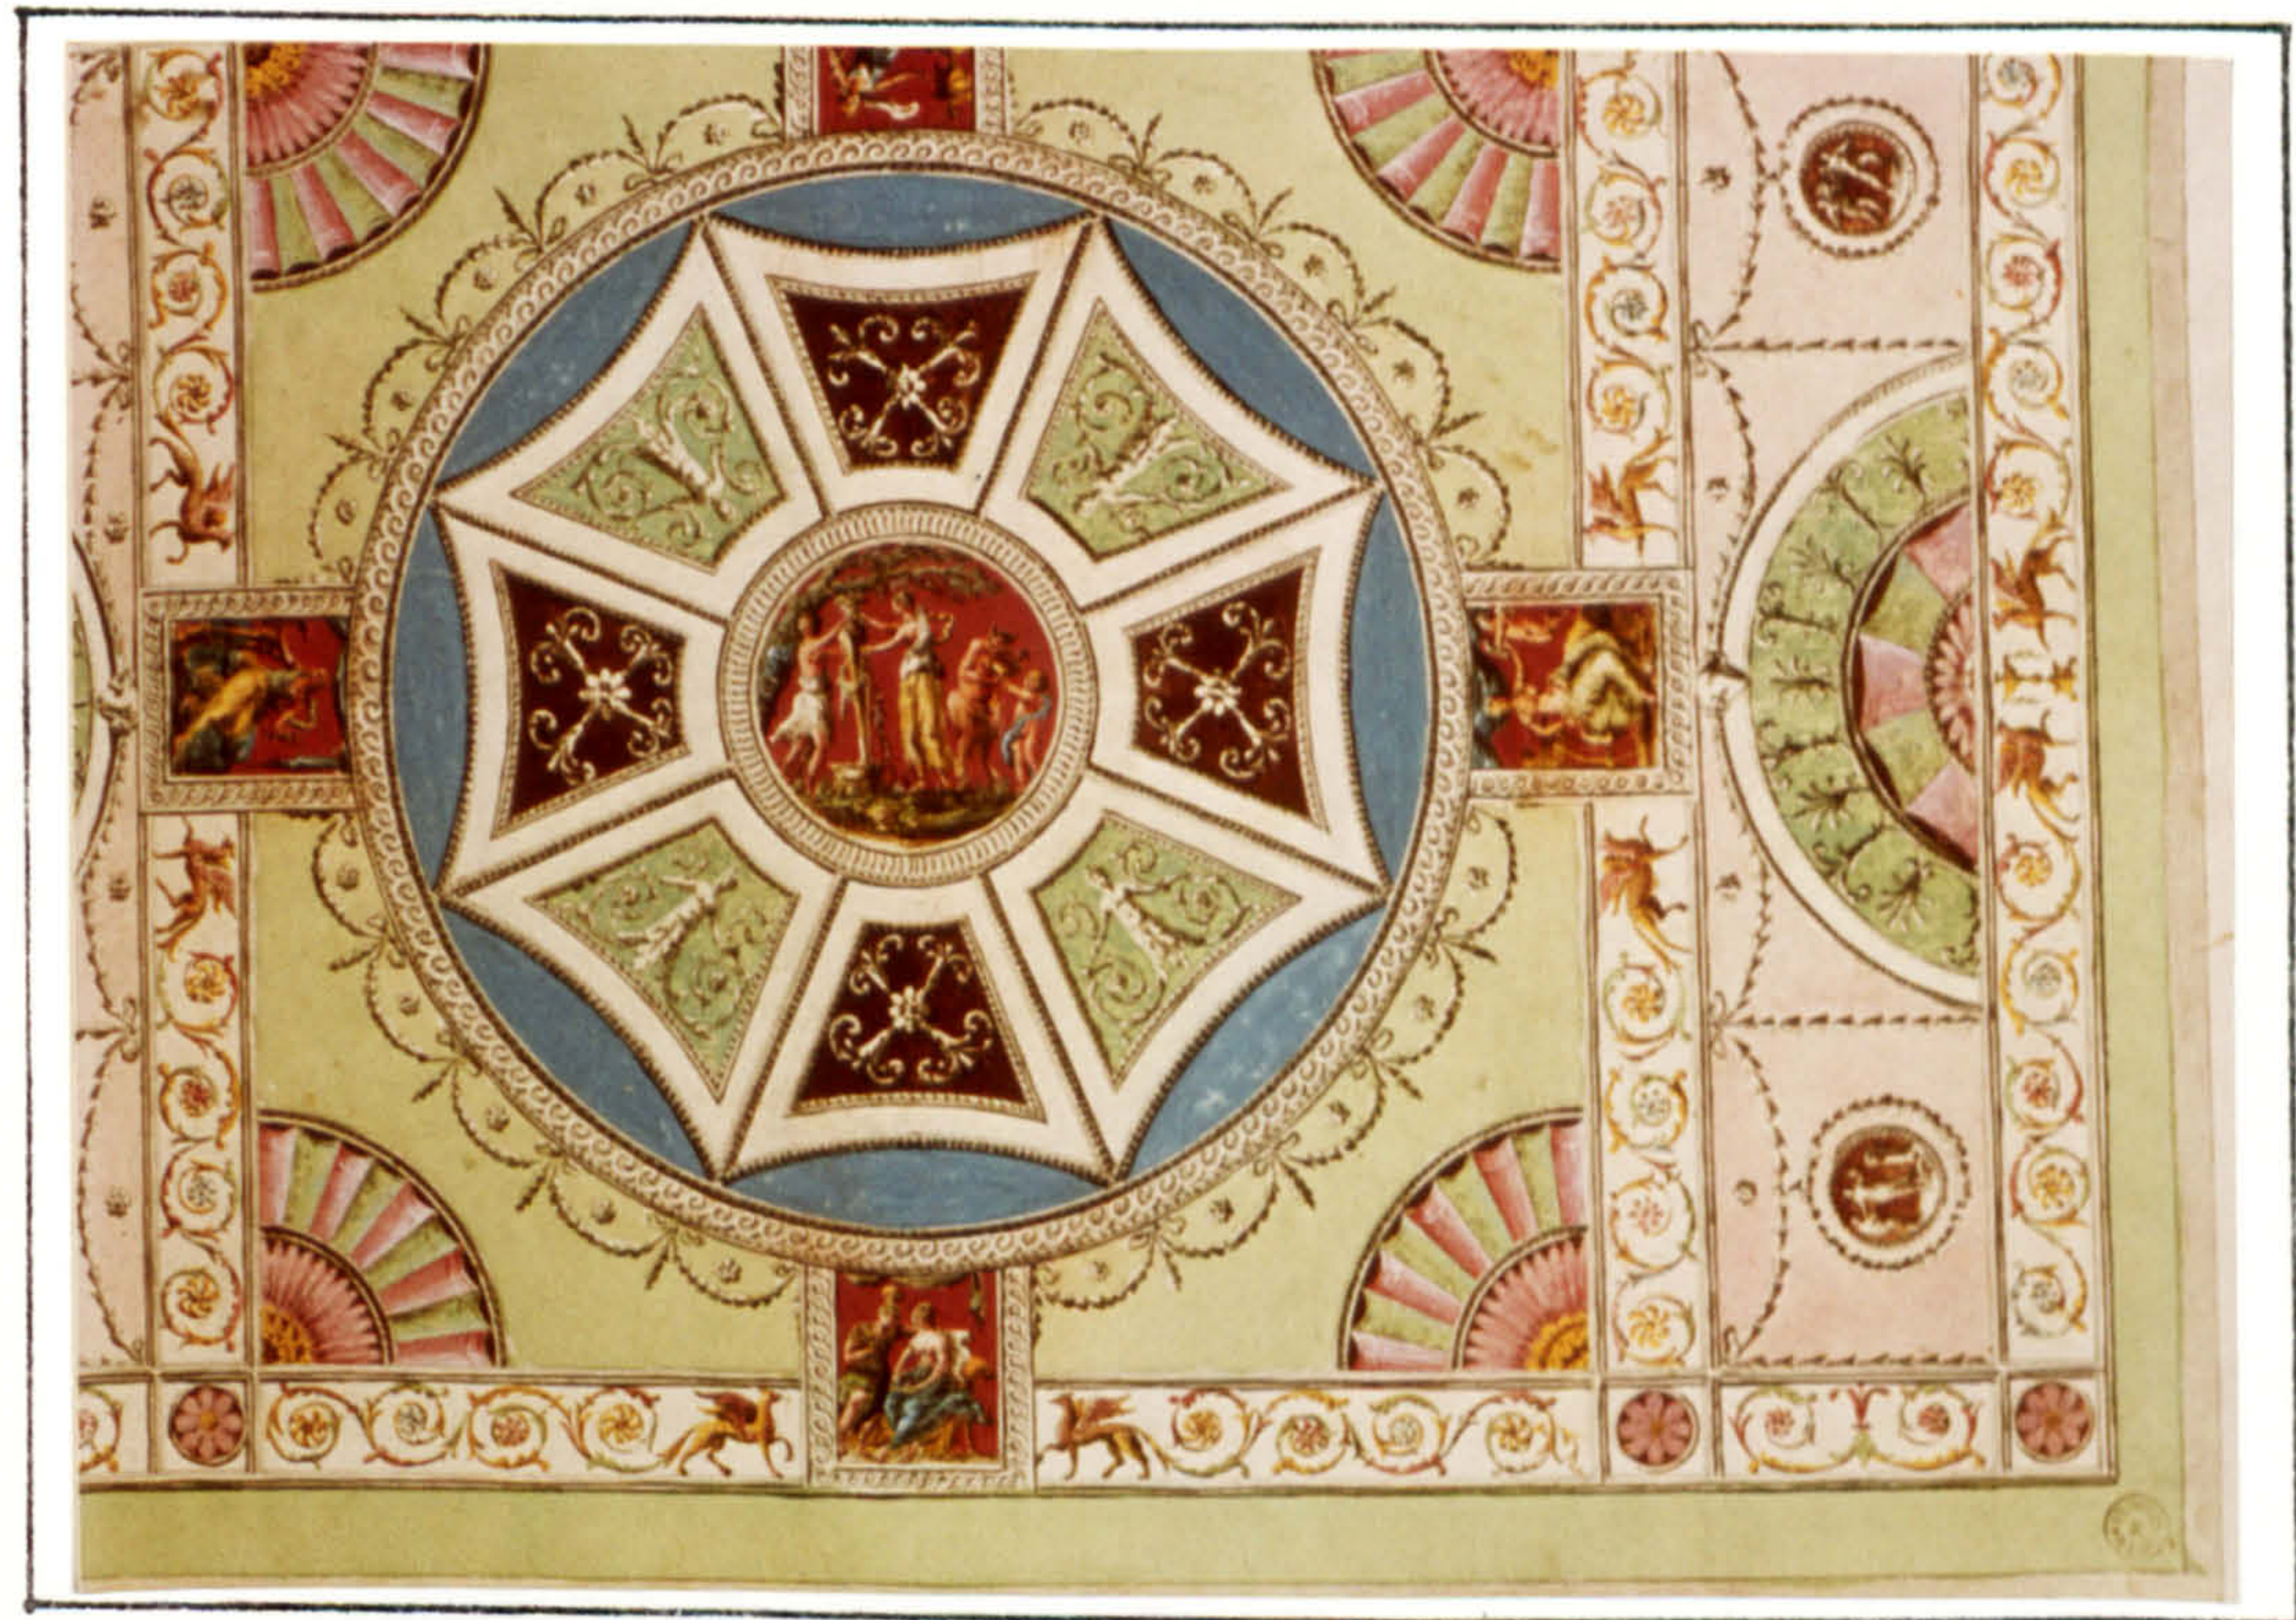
ROBERT ADAM · CEILING FOR DAVID GARRICK'S DRAWING ROOM · 1769
